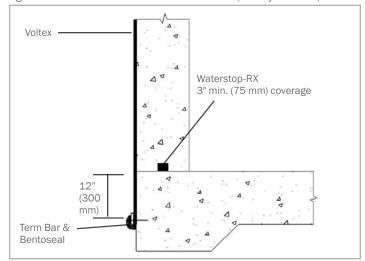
Flush slab detail backfilled wall (non-hydrostatic)
